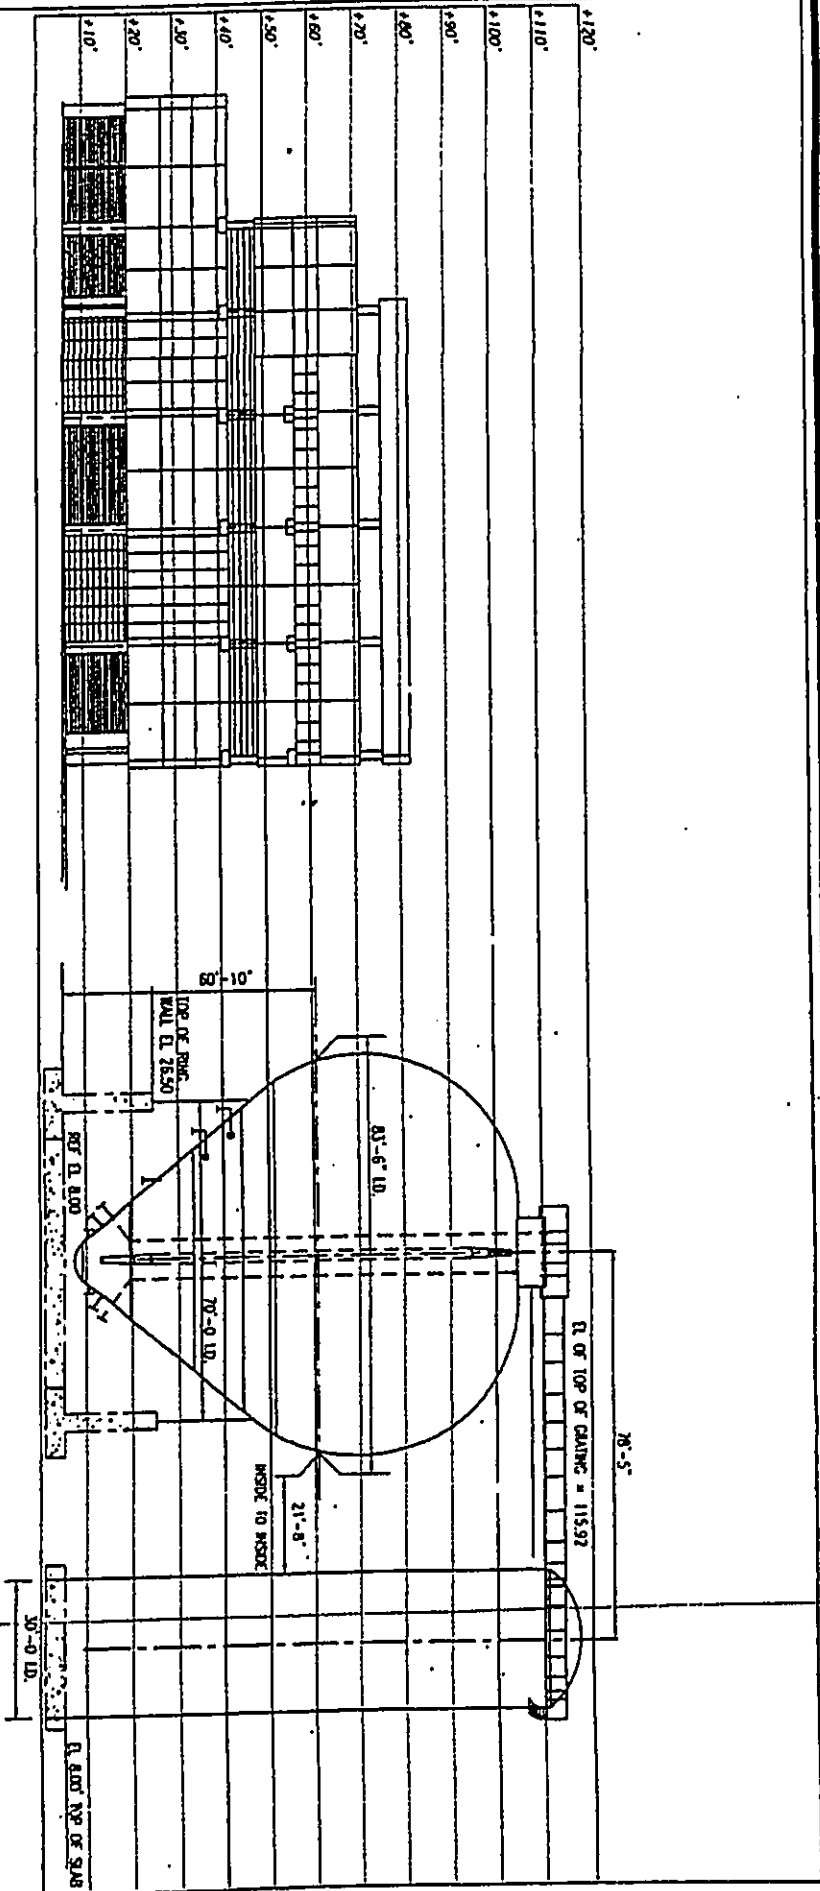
SOUTH ELEVATION VIEW OF 2.3 MGAL EGG SHAPED DIGESTER WITH SOLIDS BUILDINGS
